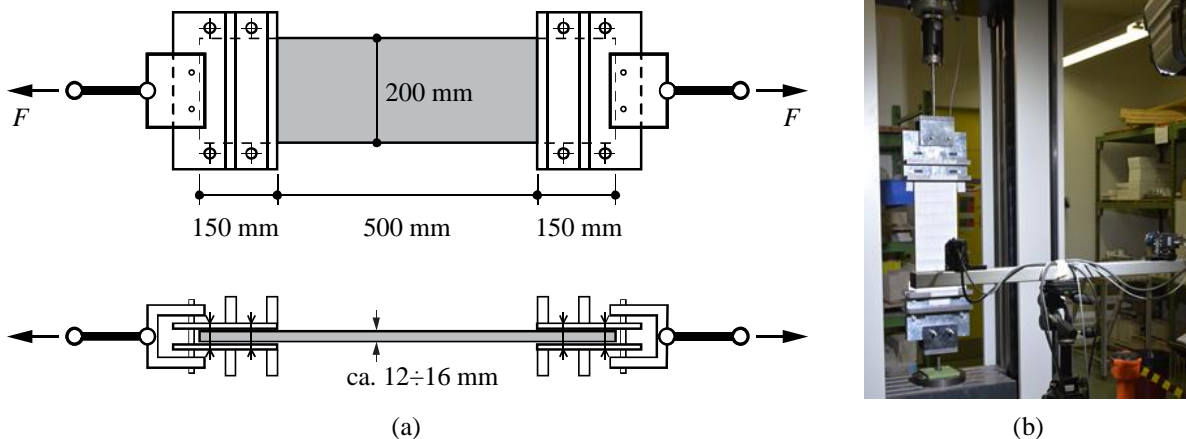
Test setup (based on the recommendation of RILEM TC 232-TDT): (a) Schematic illustration and dimensions; (b) installed specimen and setup for DIC measurement.
